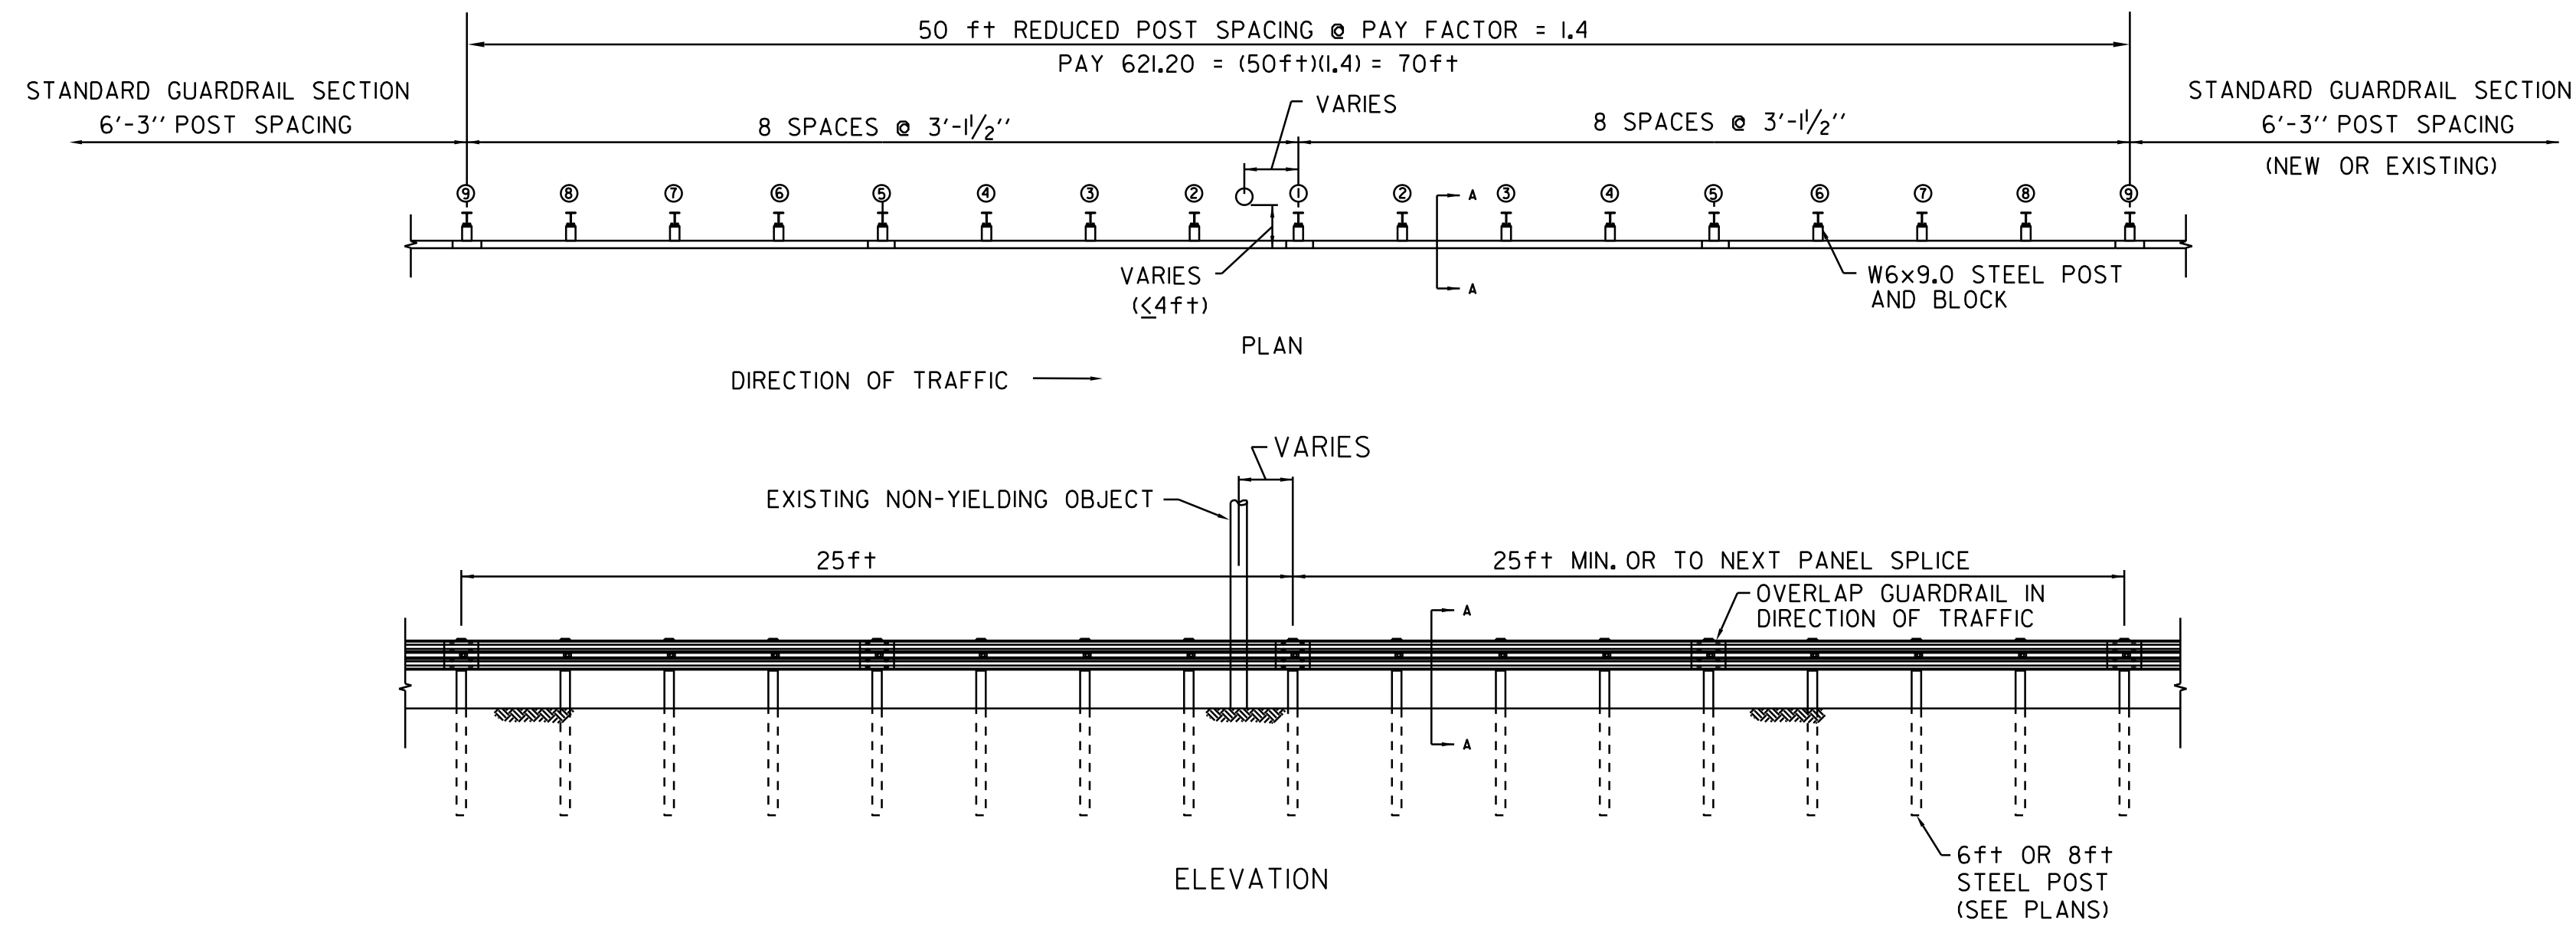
DETAIL OF STEEL BEAM GUARD RAIL AT LARGE CULVERTS
